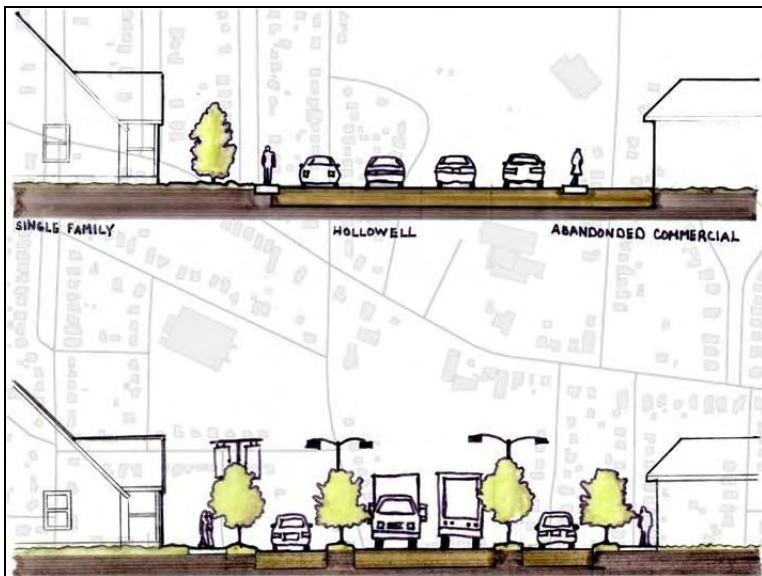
Possible cross-section along Hollowell (bottom) that separates through truck traffic from other travel lanes. Top cross-section depicts existing conditions.
